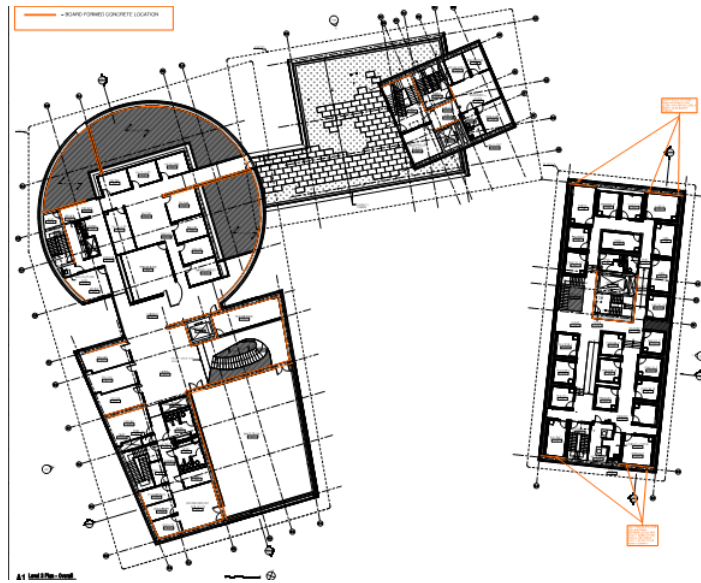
A105 – Board Form Locations throughout concrete façade structure
